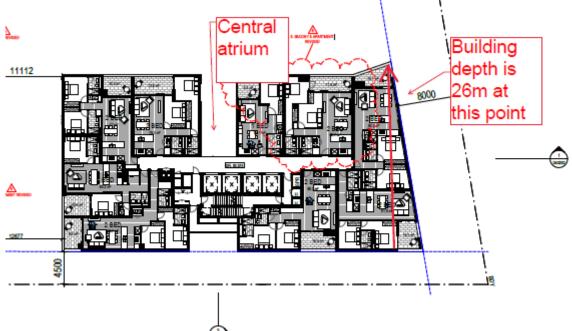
Building 1 typical floor plan depicting maximum building depth and central atrium
